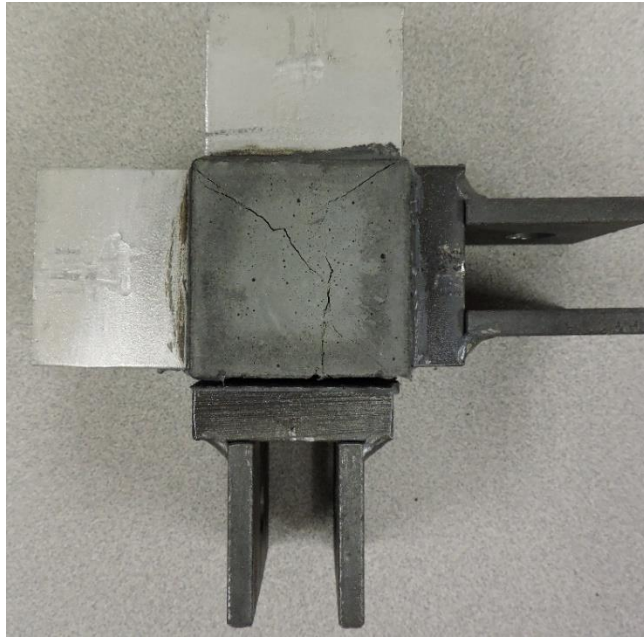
Cracking caused by TTC testing on a 2% fiber specimen with side stresses set to 600 psi (bottom clevis) and 300 psi (right clevis)
